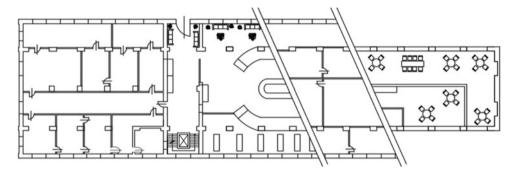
Recovery plan, layout detail. On the left, exhibition spaces, the ticket office, and the library on the ground floor; in the center, exhibition spaces on the first floor; on the right, the restaurant on the second floor (drawing by M. L. Longo)
